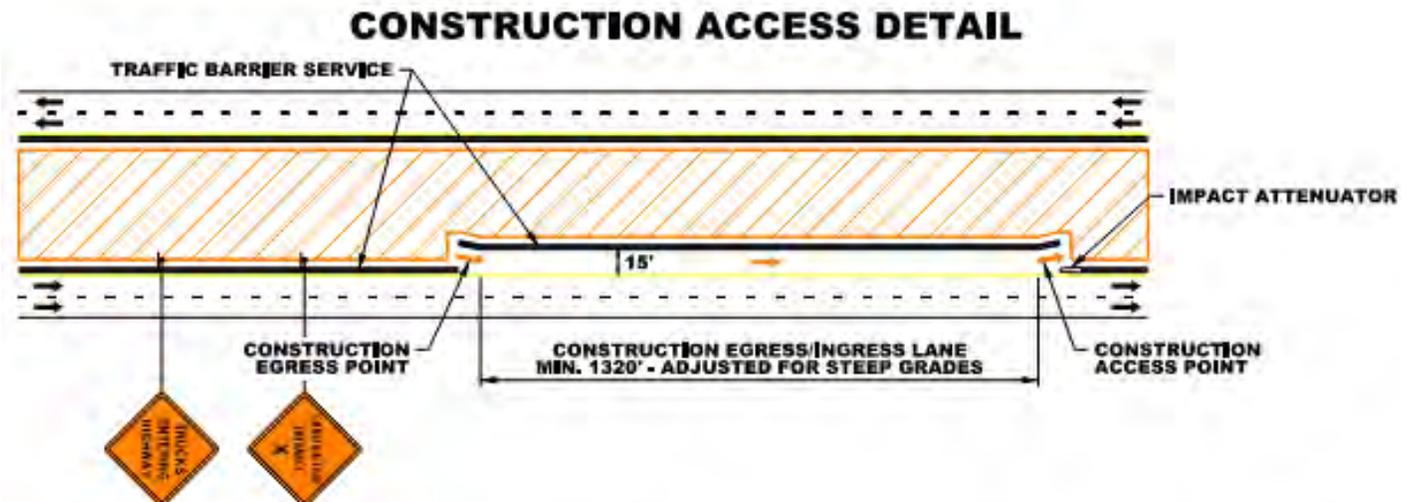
Typical Construction Ingress/Egress Scheme
